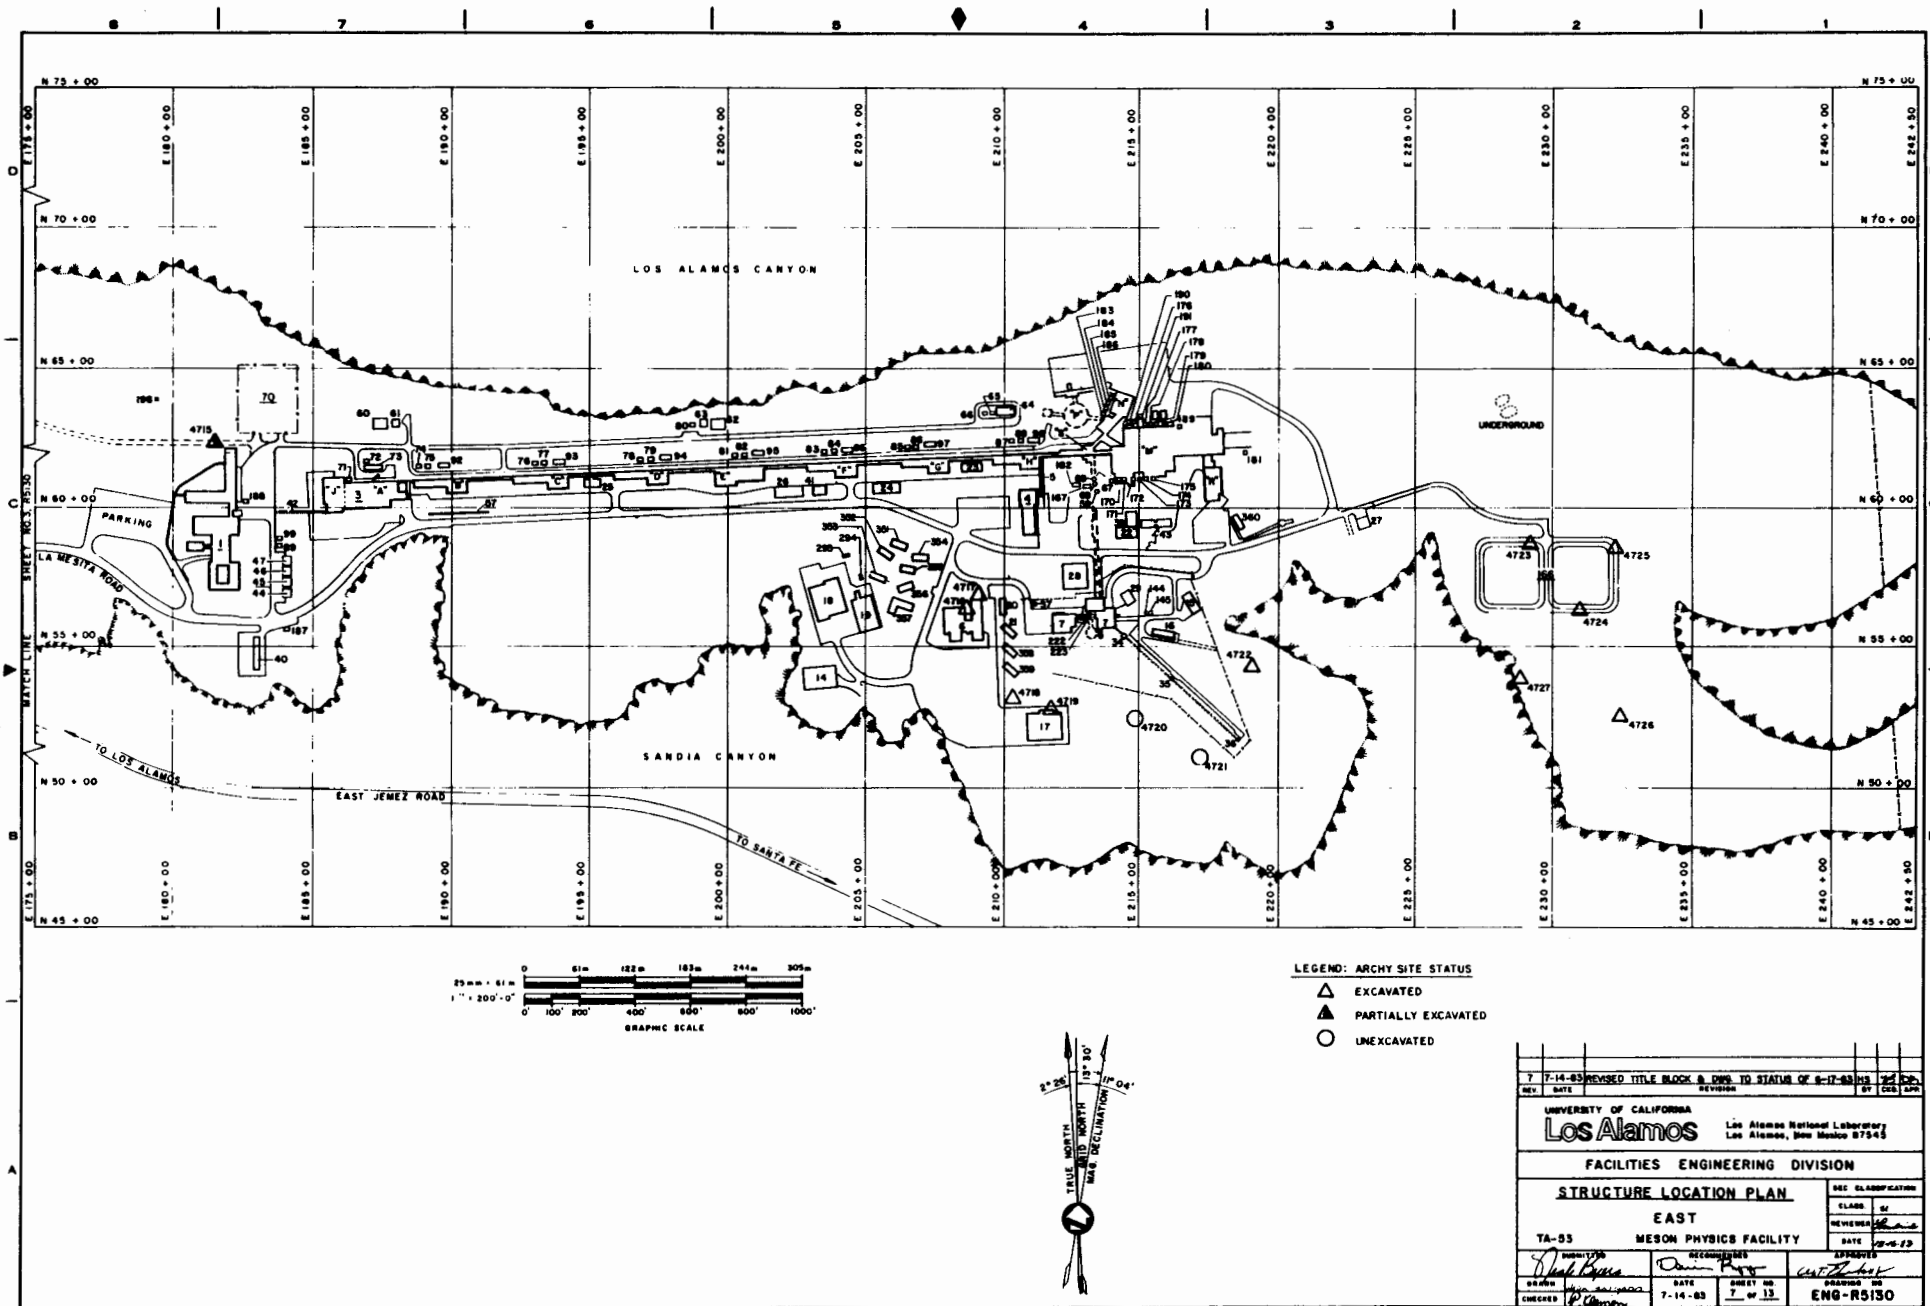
Structure Location Plan for TA-53 - Meson Physics Facility (1983 Drawing from the LANL Technical Area Structure Location Plans)
